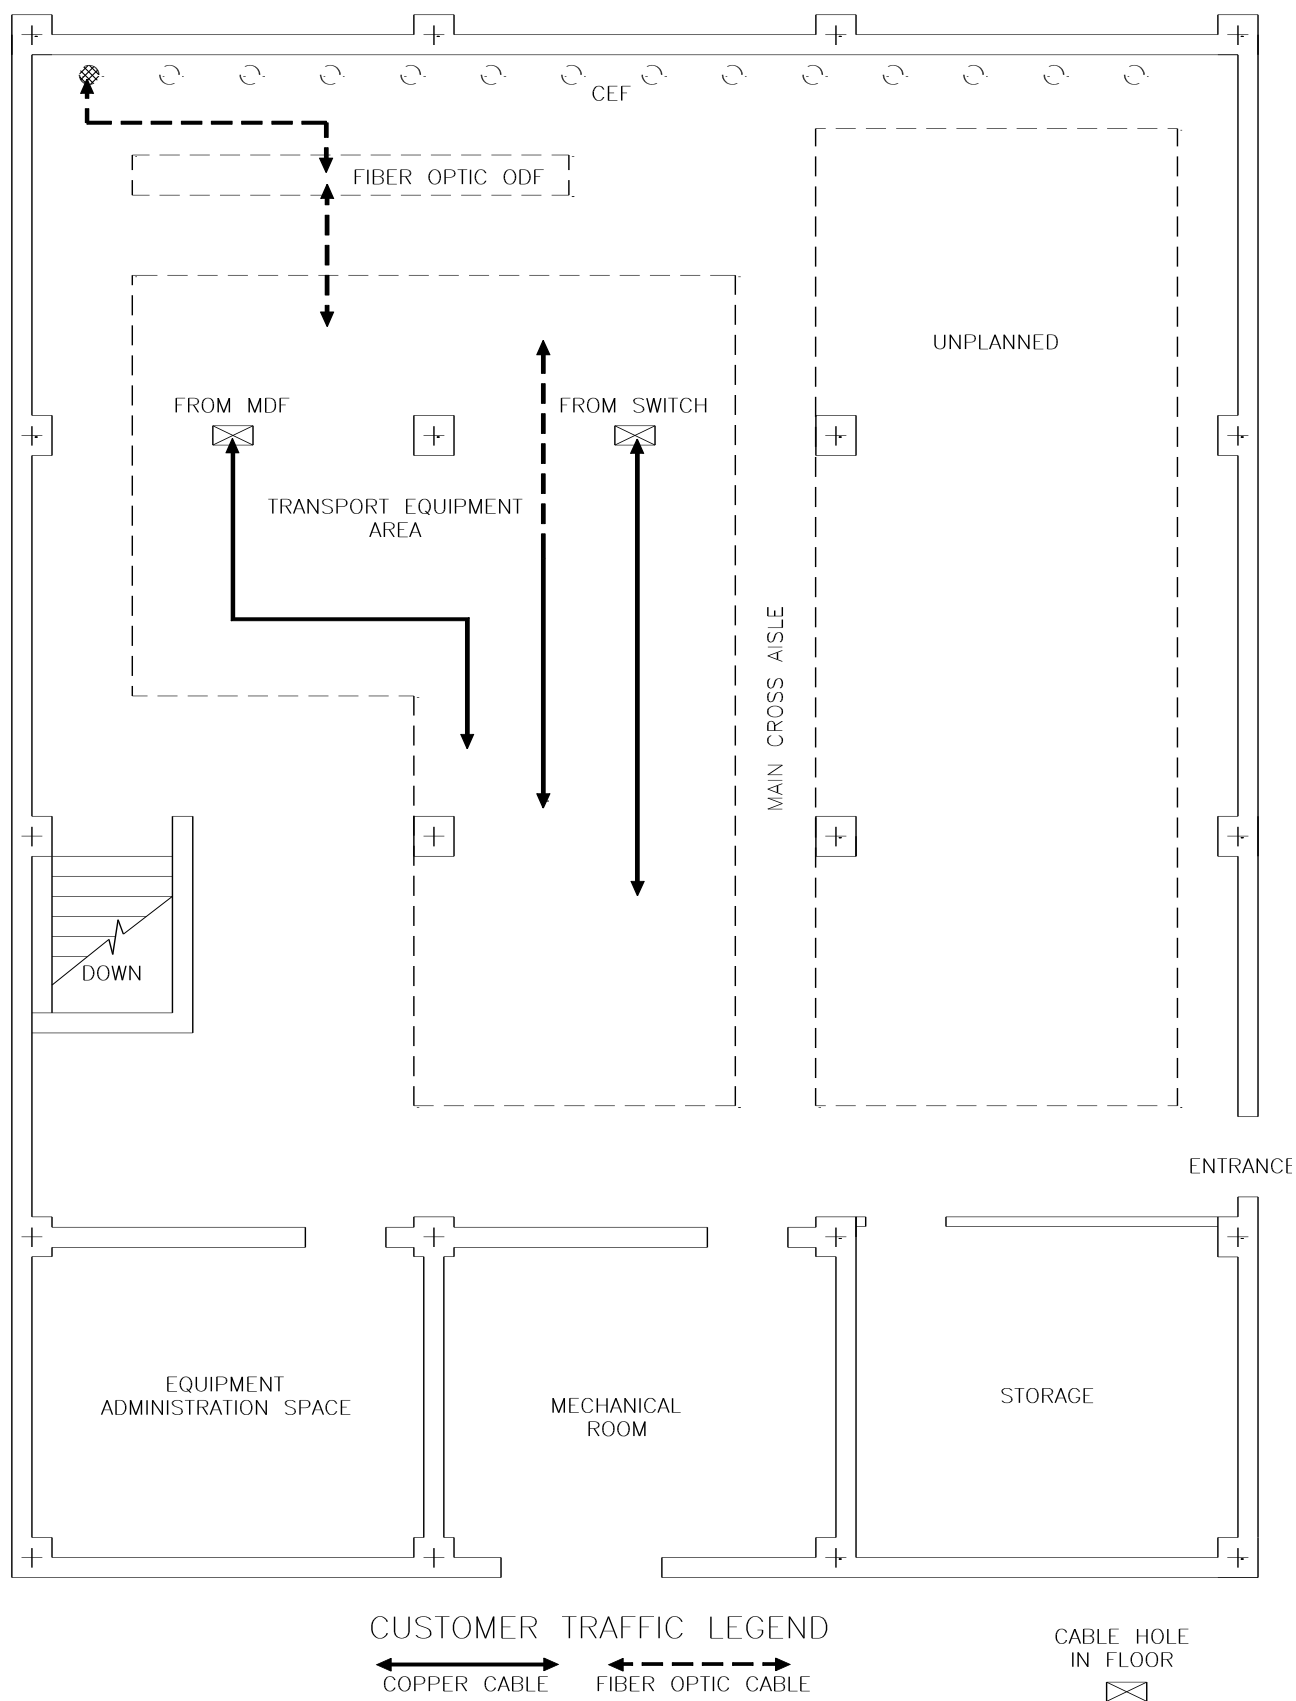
Generic Model Of Single Story Network Equipment Building
